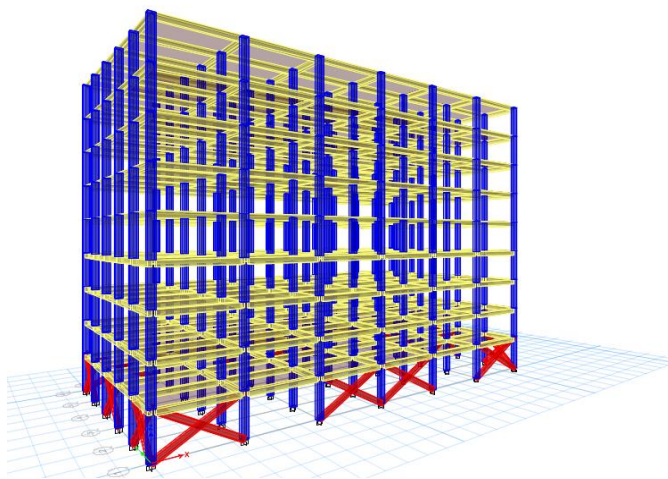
3D view of building model with bracings as the lateral load resisting system.
